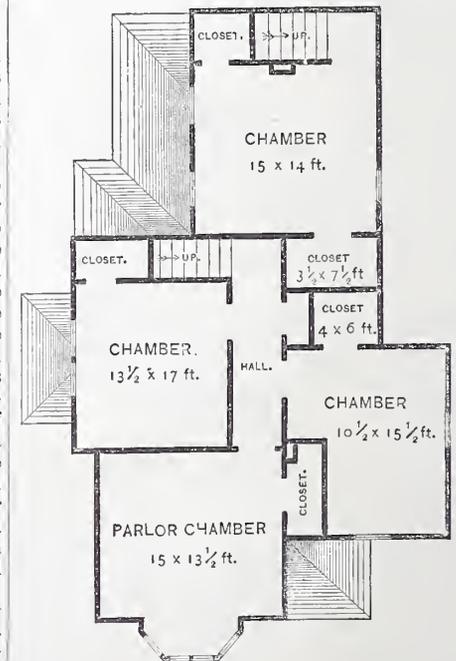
Second Floor Plan.—Scale, 1-16 Inch to the Foot.
